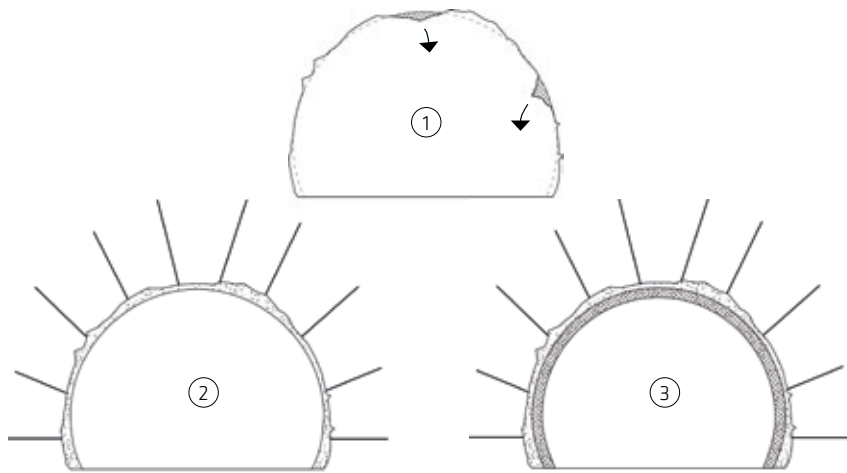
Main tunneling steps: Excavation and profiling (1), stabilization with shotcrete and rock bolts (2), lining with concrete (3)
